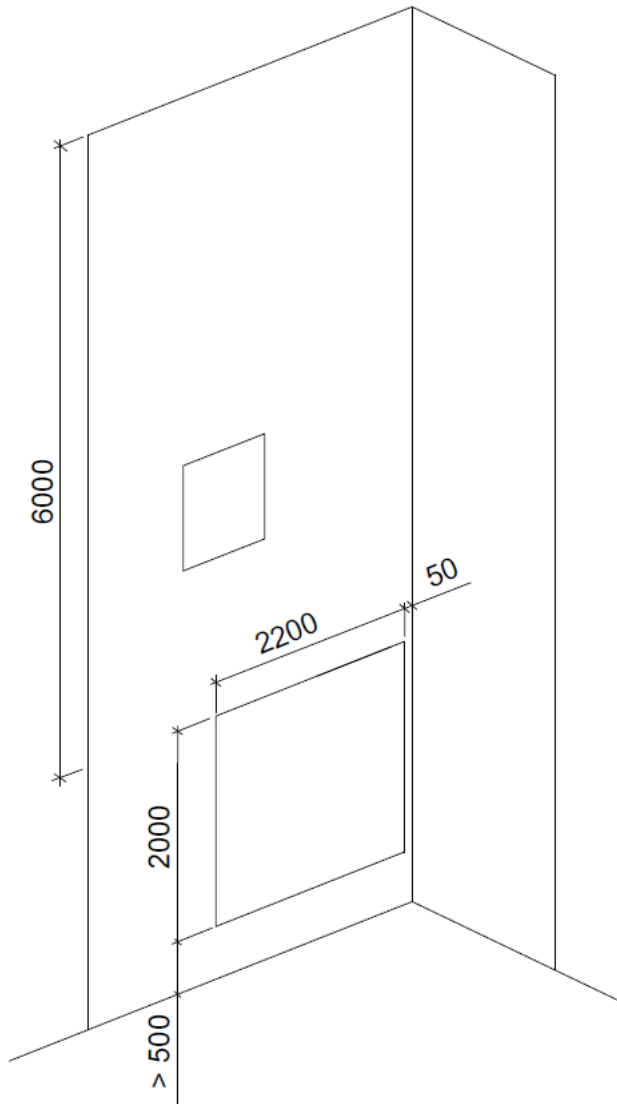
Test rig with opening for the combustion chamber that can be used for both medium and large fire exposure. It shall be noted that parts of the opening must be closed irrespectively of which fire exposure to be used.
